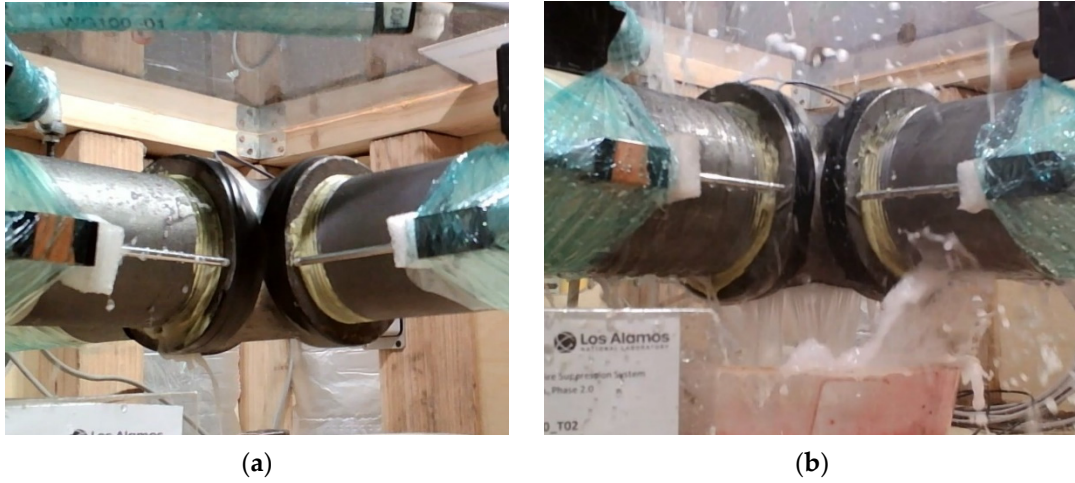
Tee Fitting Rupture Observed in Lab: (a) Leakage Prior to Rupture; (b) Fitting Body Rupture.
